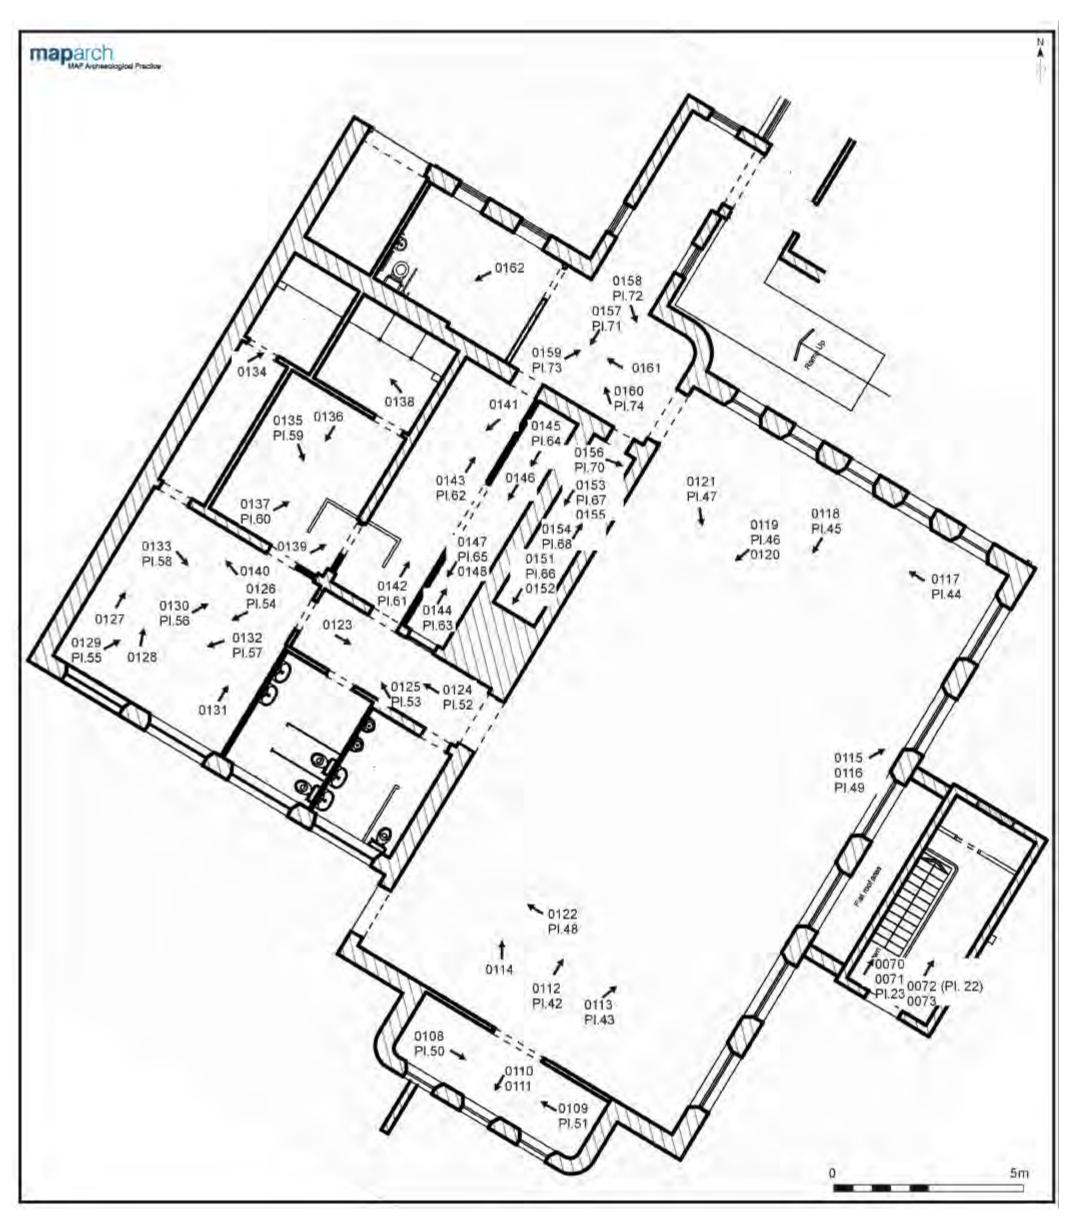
Ground Floor Plan with Photographs (Plate) Locations.
